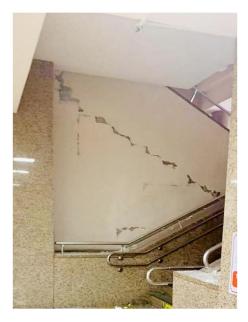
Nonstructural damage observed in windows, exterior and interior infill walls, and staircases of the Courthouse in Izmir (Yurt Gazetesi, 2020).
